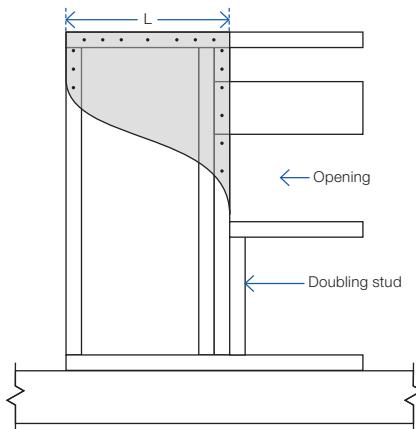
GS BRACING ELEMENTS (OPTION A)
